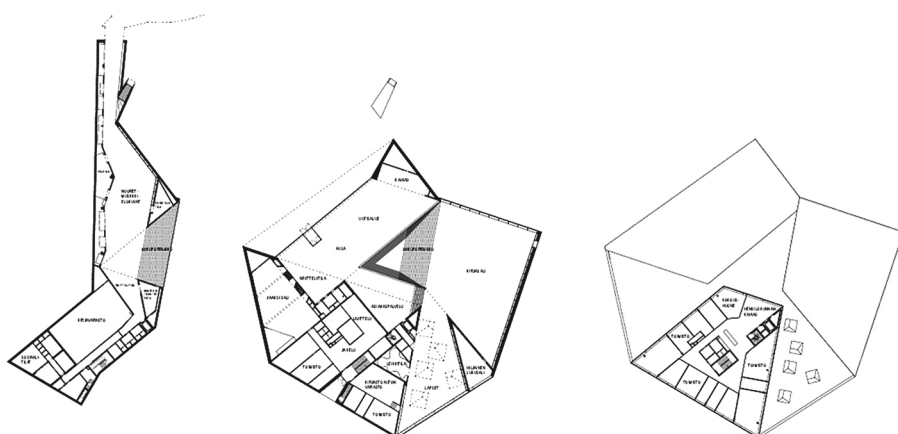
Seinäjoki Library (2012) Underground plan with passage to the original building, main ground floor plan and first floor plan (source: <https://www.archdaily.com/360049/city-library-in-seinajoki-jkmm-architects>)
